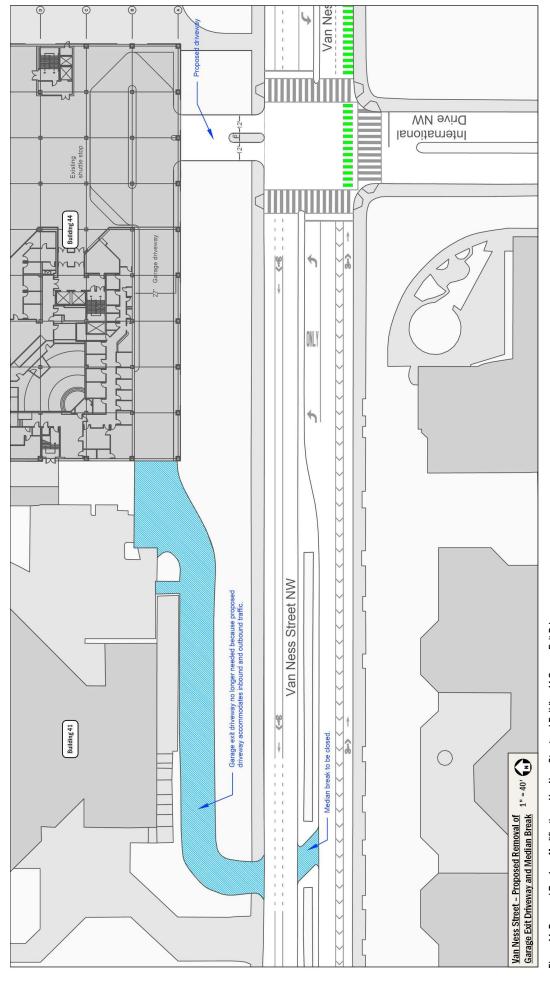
Proposed Roadway Modifications: Van Ness Street and Building 44 Garage Exit Driveway
